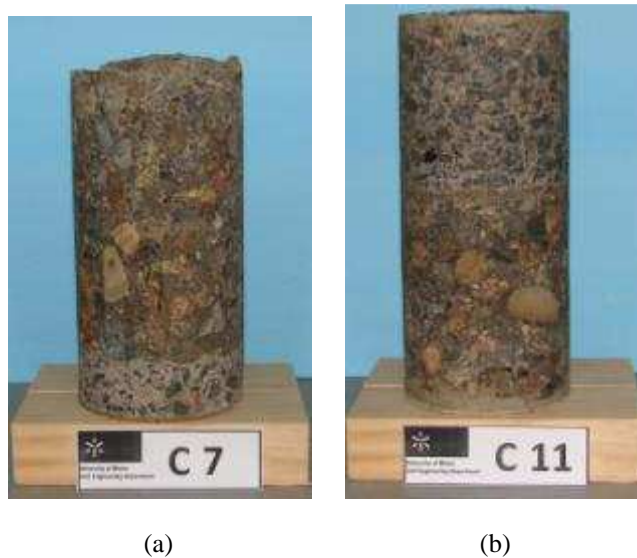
Concrete cores taken from bridge. (a) C7 – transversal beam, (b) C11 – bridge deck.
